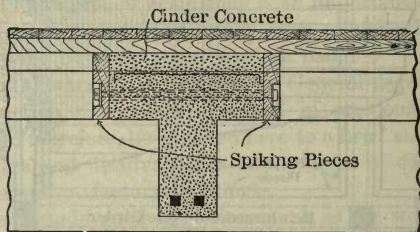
Section of Concrete Beam, Combination Concrete and Mill Construction.
